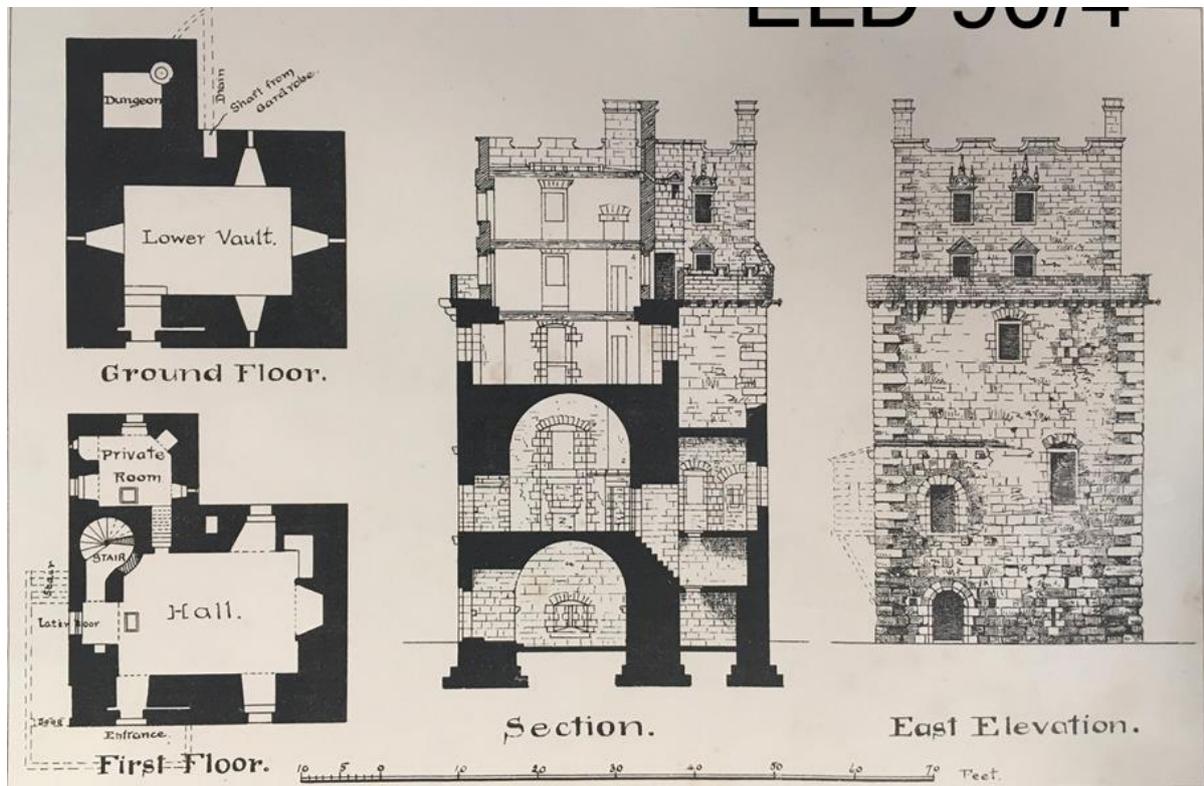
Plan of Preston Tower in 1888 showing the timber stairs to the first floor (Crown Copyright Historic Environment Scotland ELD 90/4)
